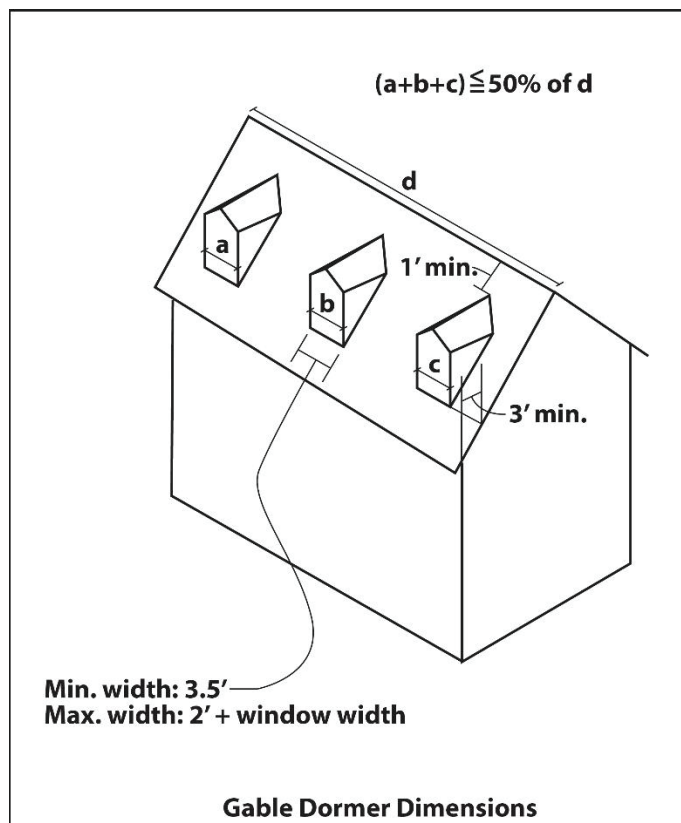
o.5: Gable Dormer Dimensions
